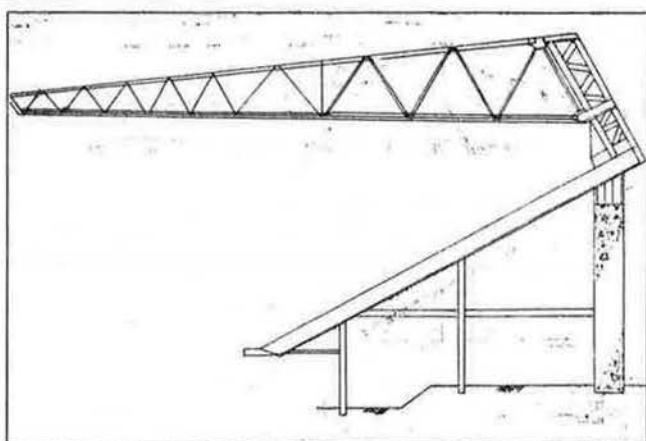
Typical cross-section of structure - the East stand at Murrayfield, Edinburgh
